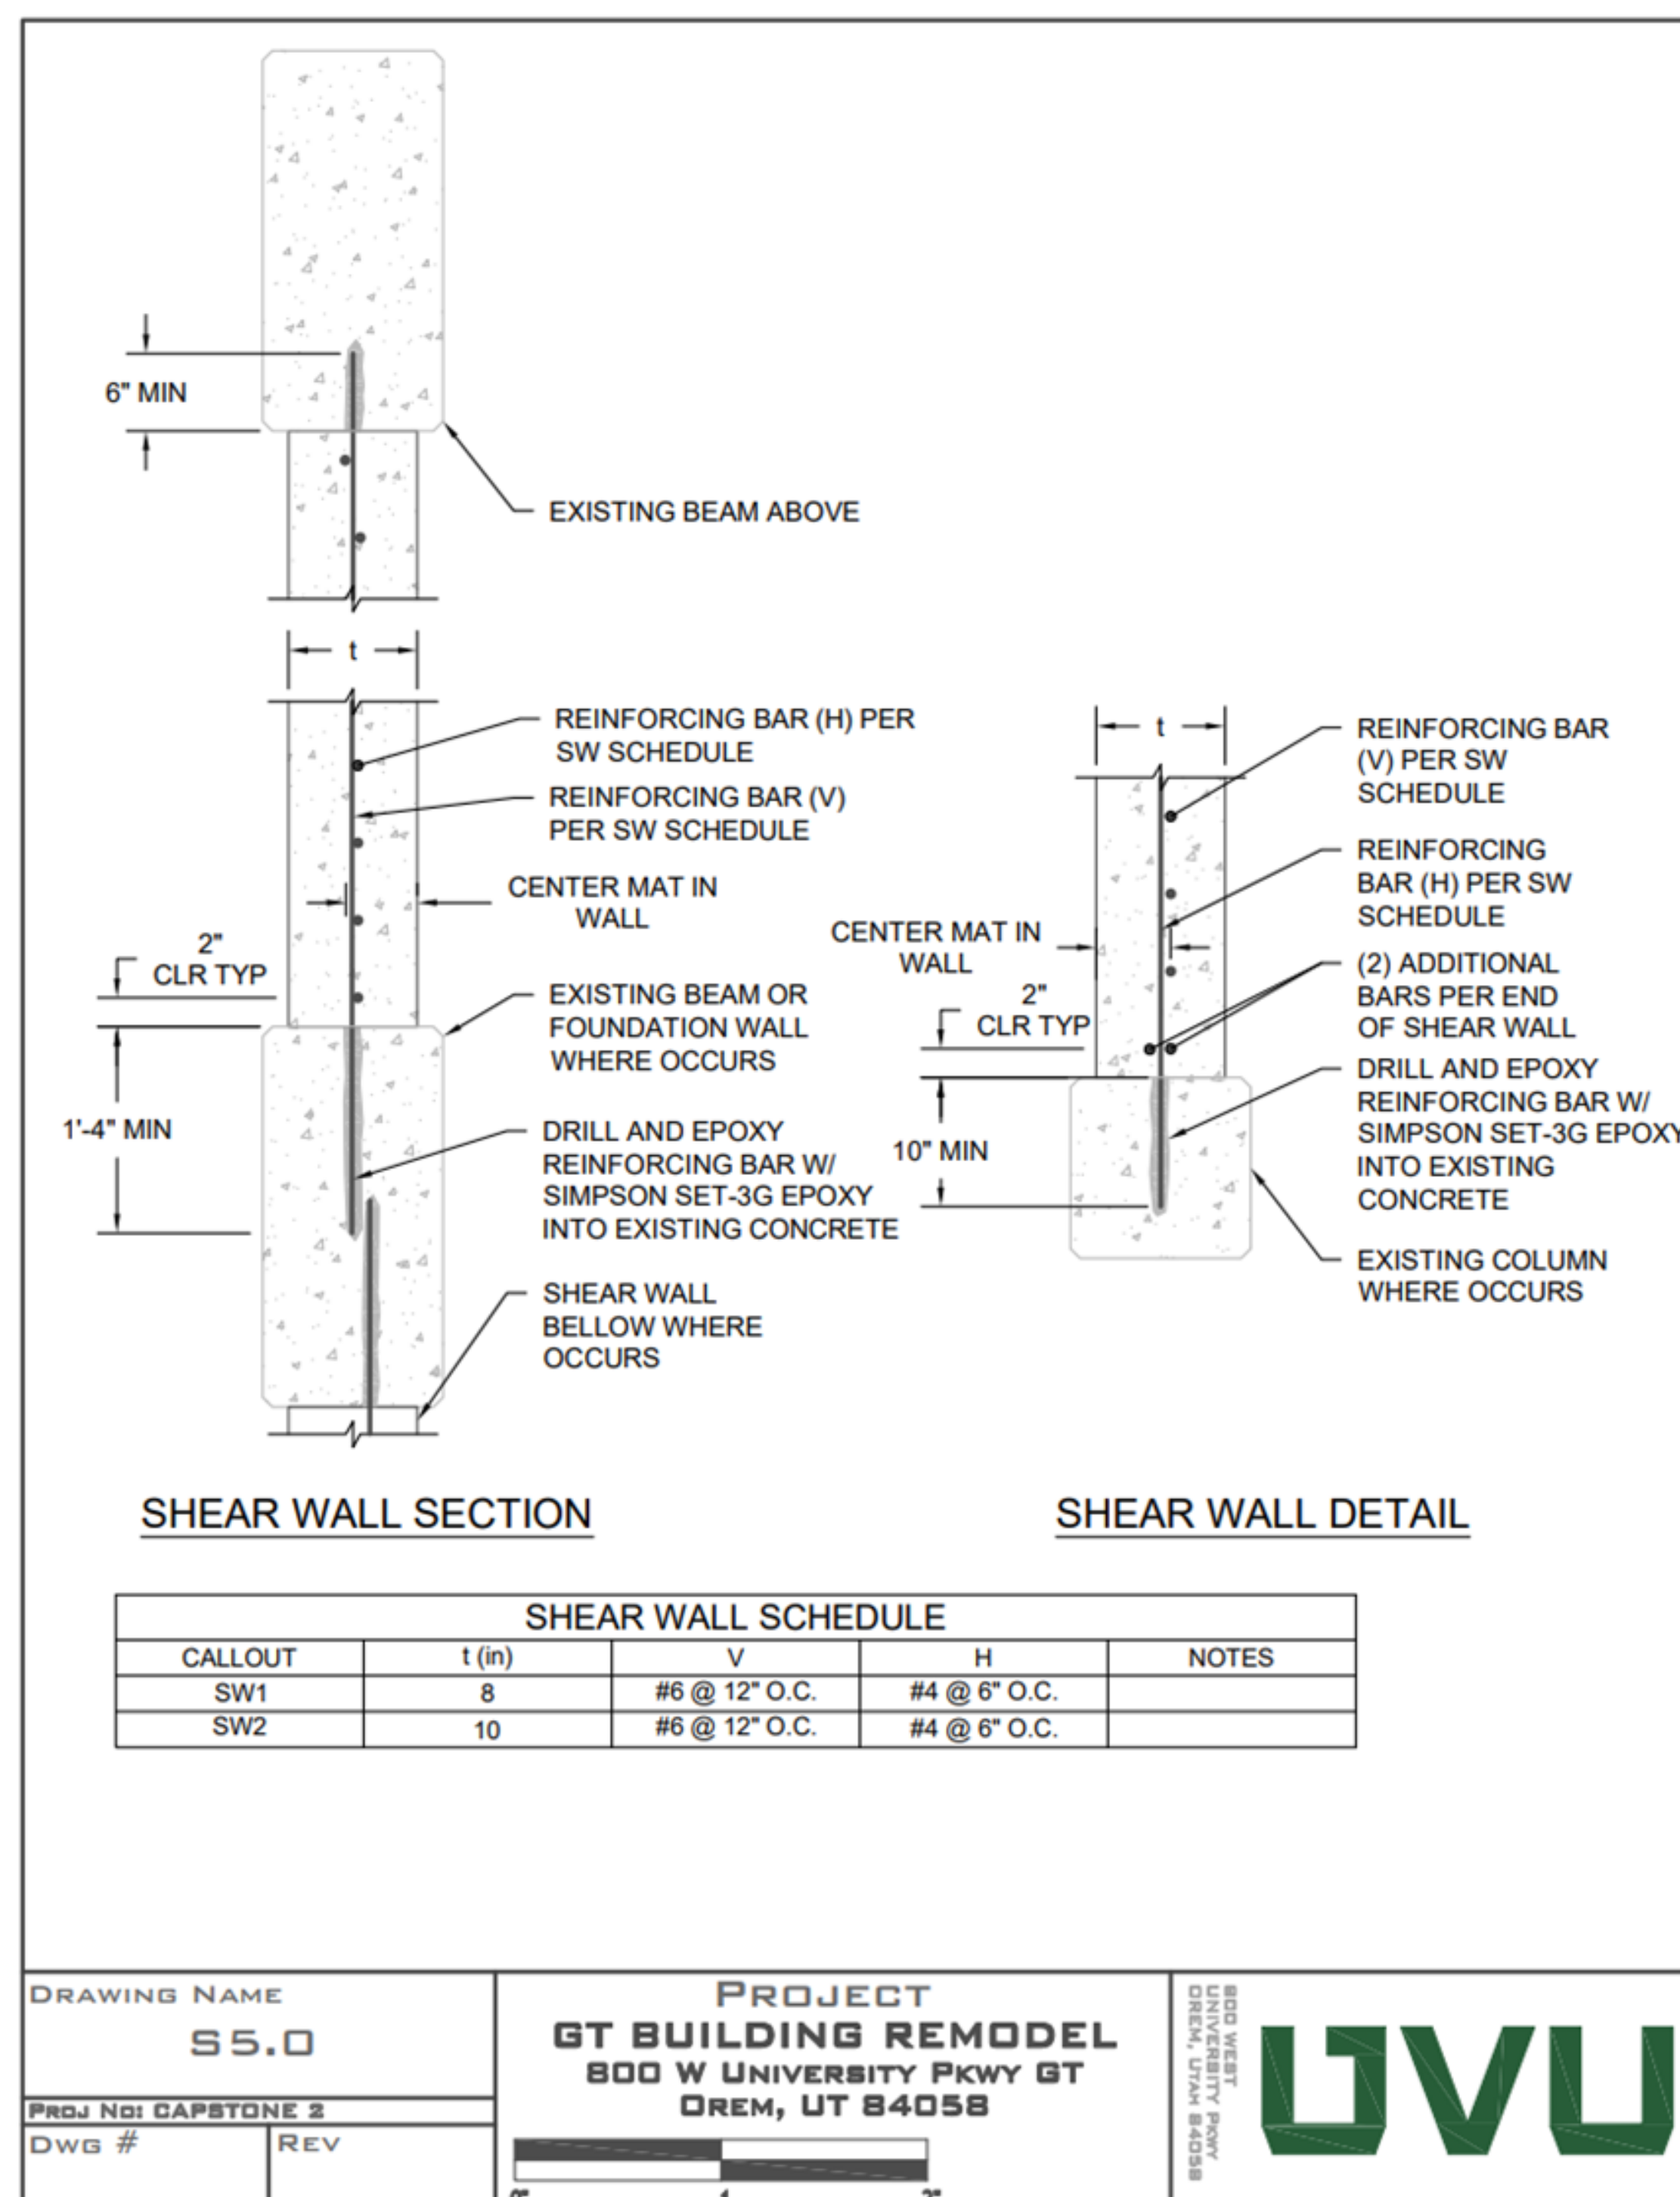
Shear Wall Detail for Single Mat of Reinforcement.
